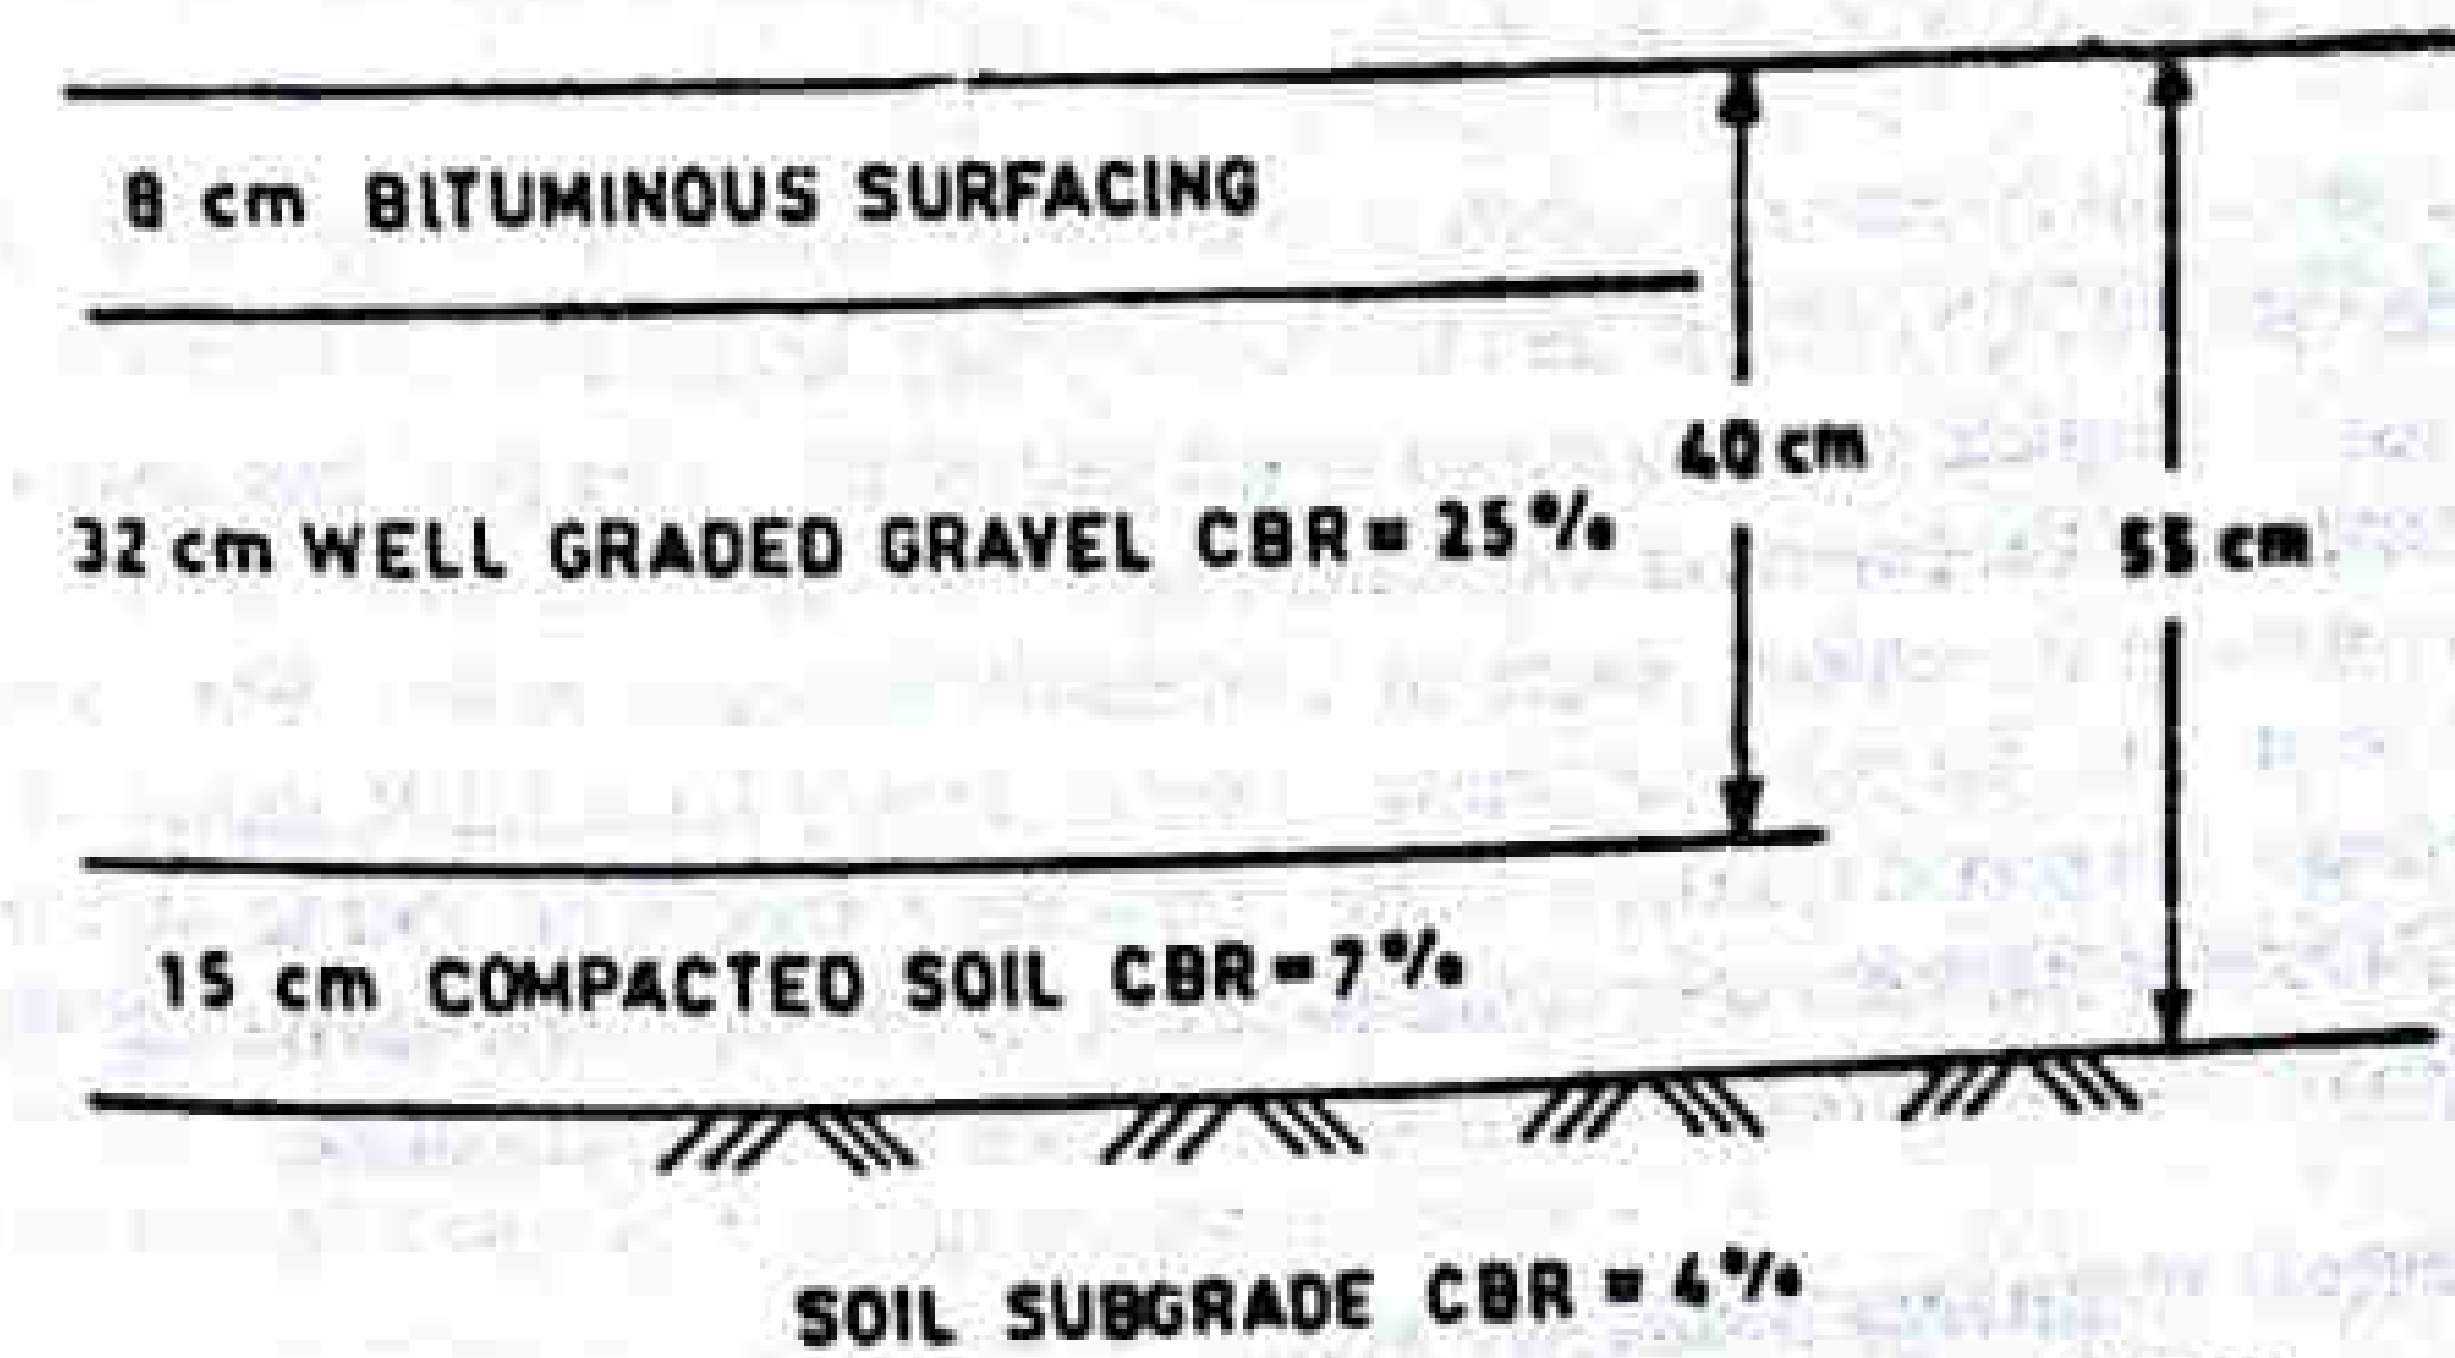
Alternate Pavement Section (Example 7.5)
